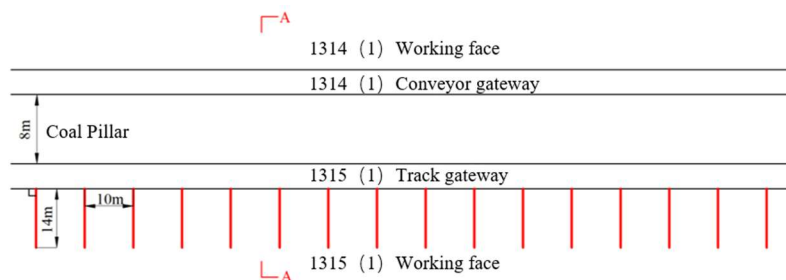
Plan view of hydraulic fracturing in 1315(1) track gateway
